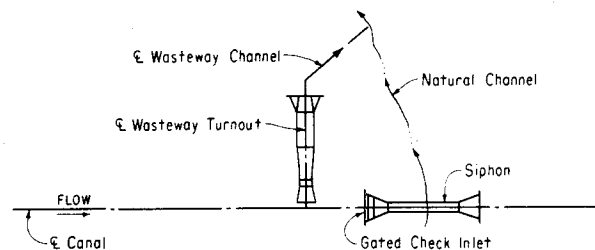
General plan of typical canal with wasteway turnout. 103-D-1299
